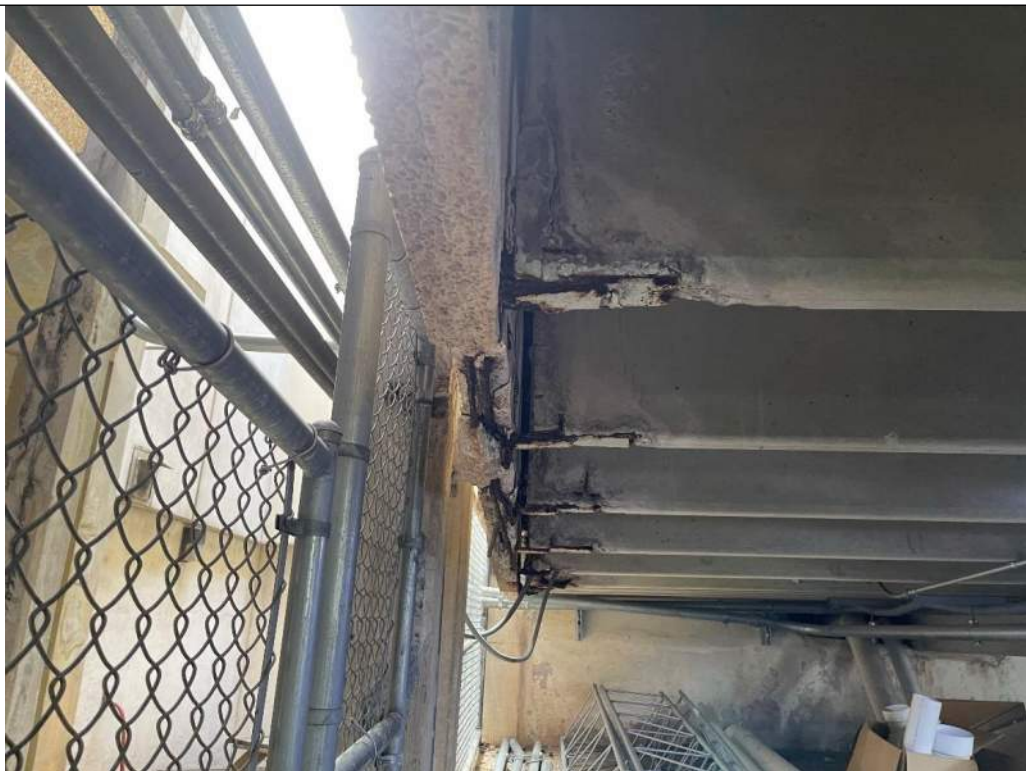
Spalling concrete and corroded reinforcing steel at underside of Level 1A along west edge of structure
